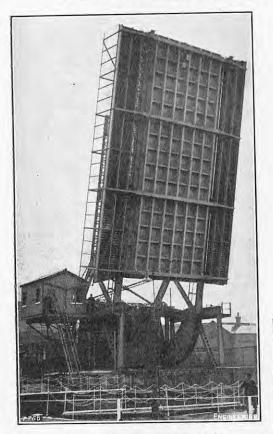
BRIDGE RAISED ON QUADRANT GIRDERS.
